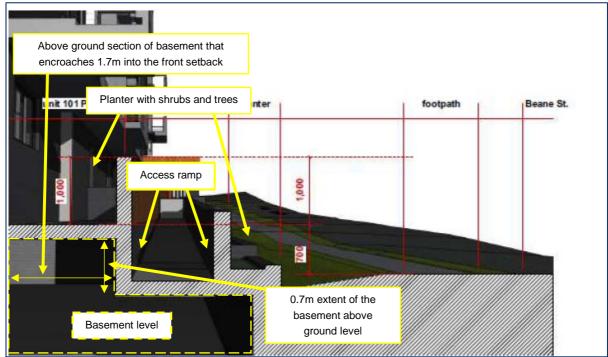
| Detailed cross section of the front setback to Beane Street (Source: Applicant's RtS)
